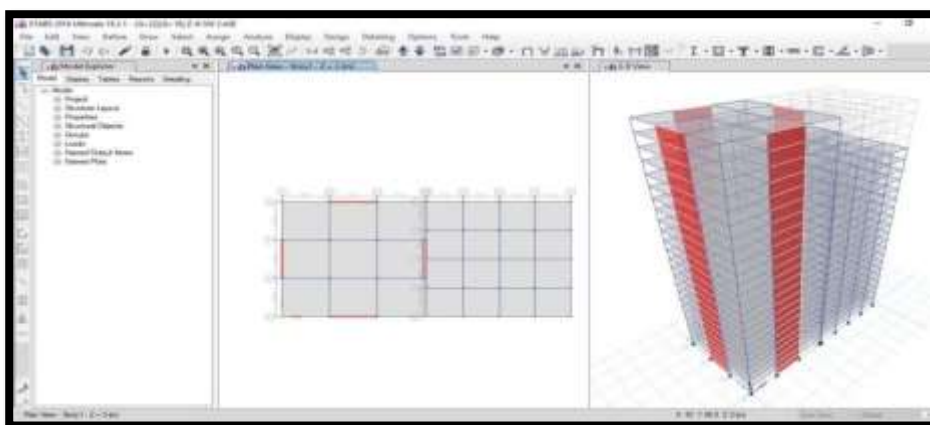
Plan and 3dviewof(G+22)(G+18)buildingswith shearwallcase
